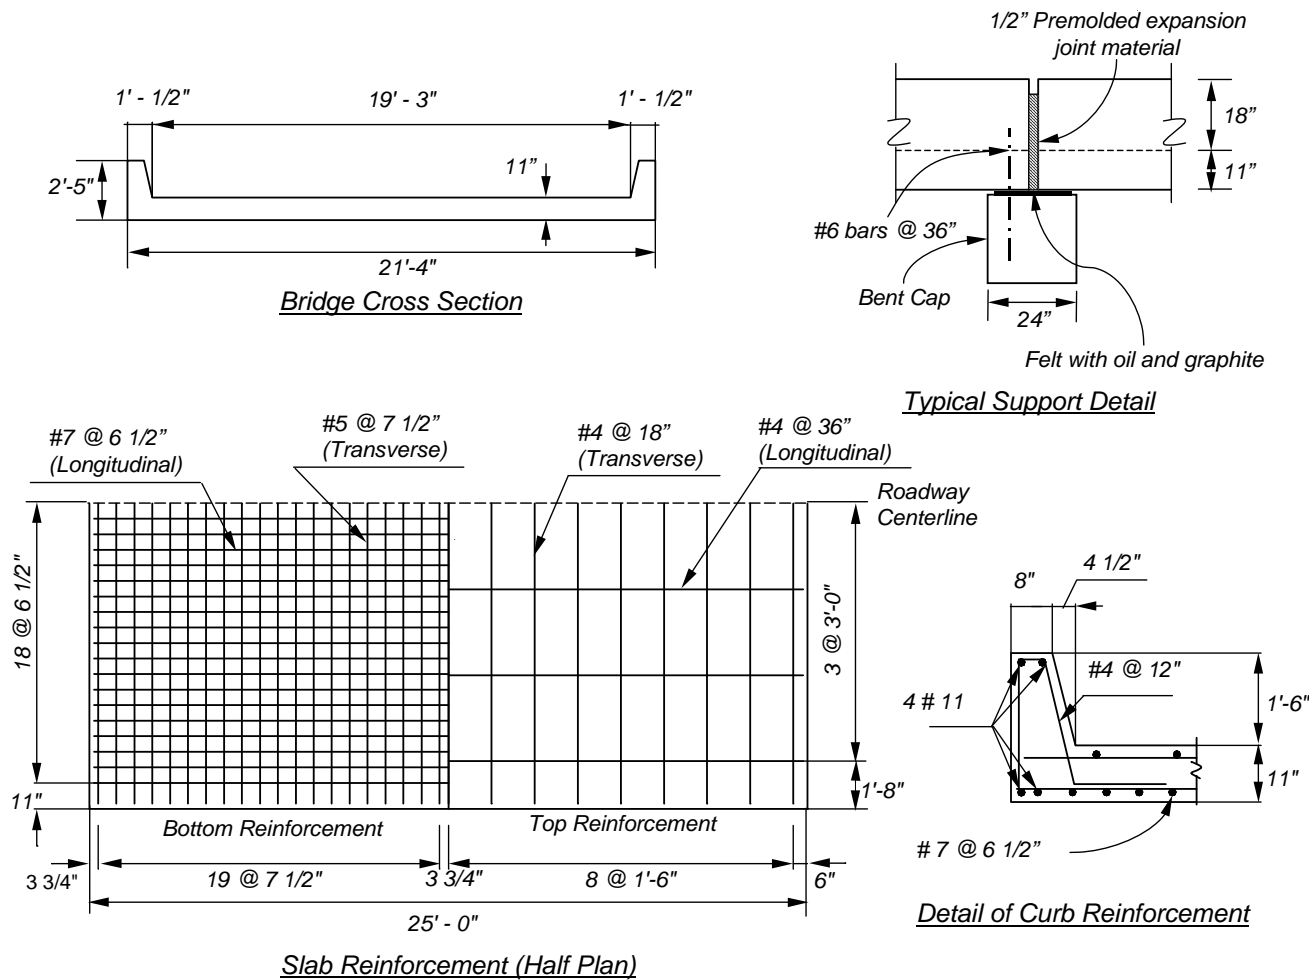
Reinforcement Details for FS-Slab Prototype Bridge
